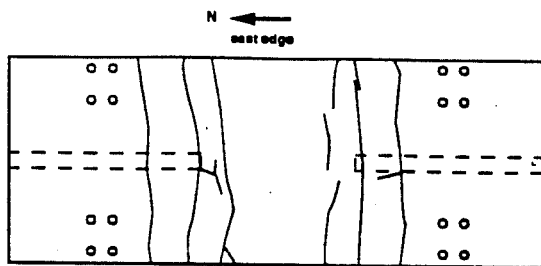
Sp. 2a: Progression of Cracking of Top Face of Roof Slab at Load Point 284
